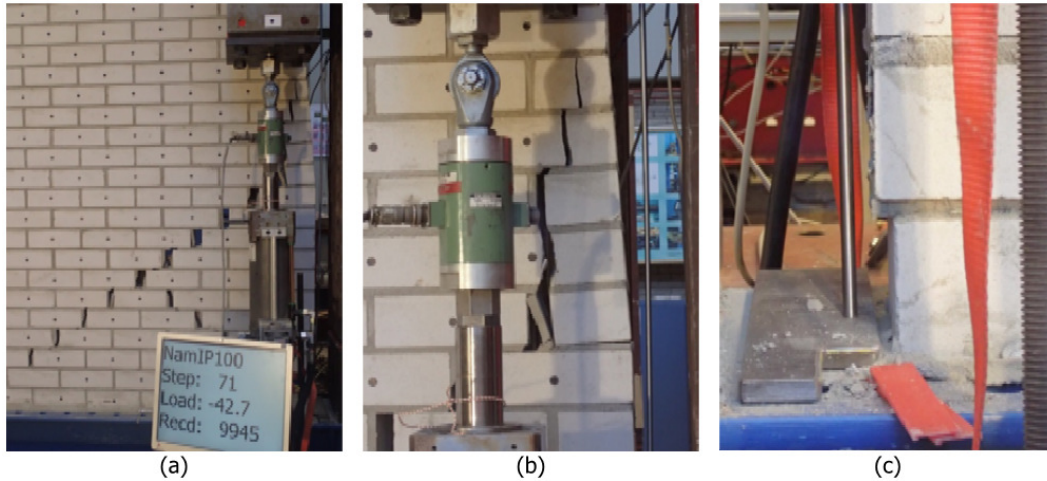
TUD-COMP-5: Details of final crack patterns: diagonal cracks at the bottom-right corner (a), vertical cracks through bricks (b), residual sliding at the bottom left corner (c)
